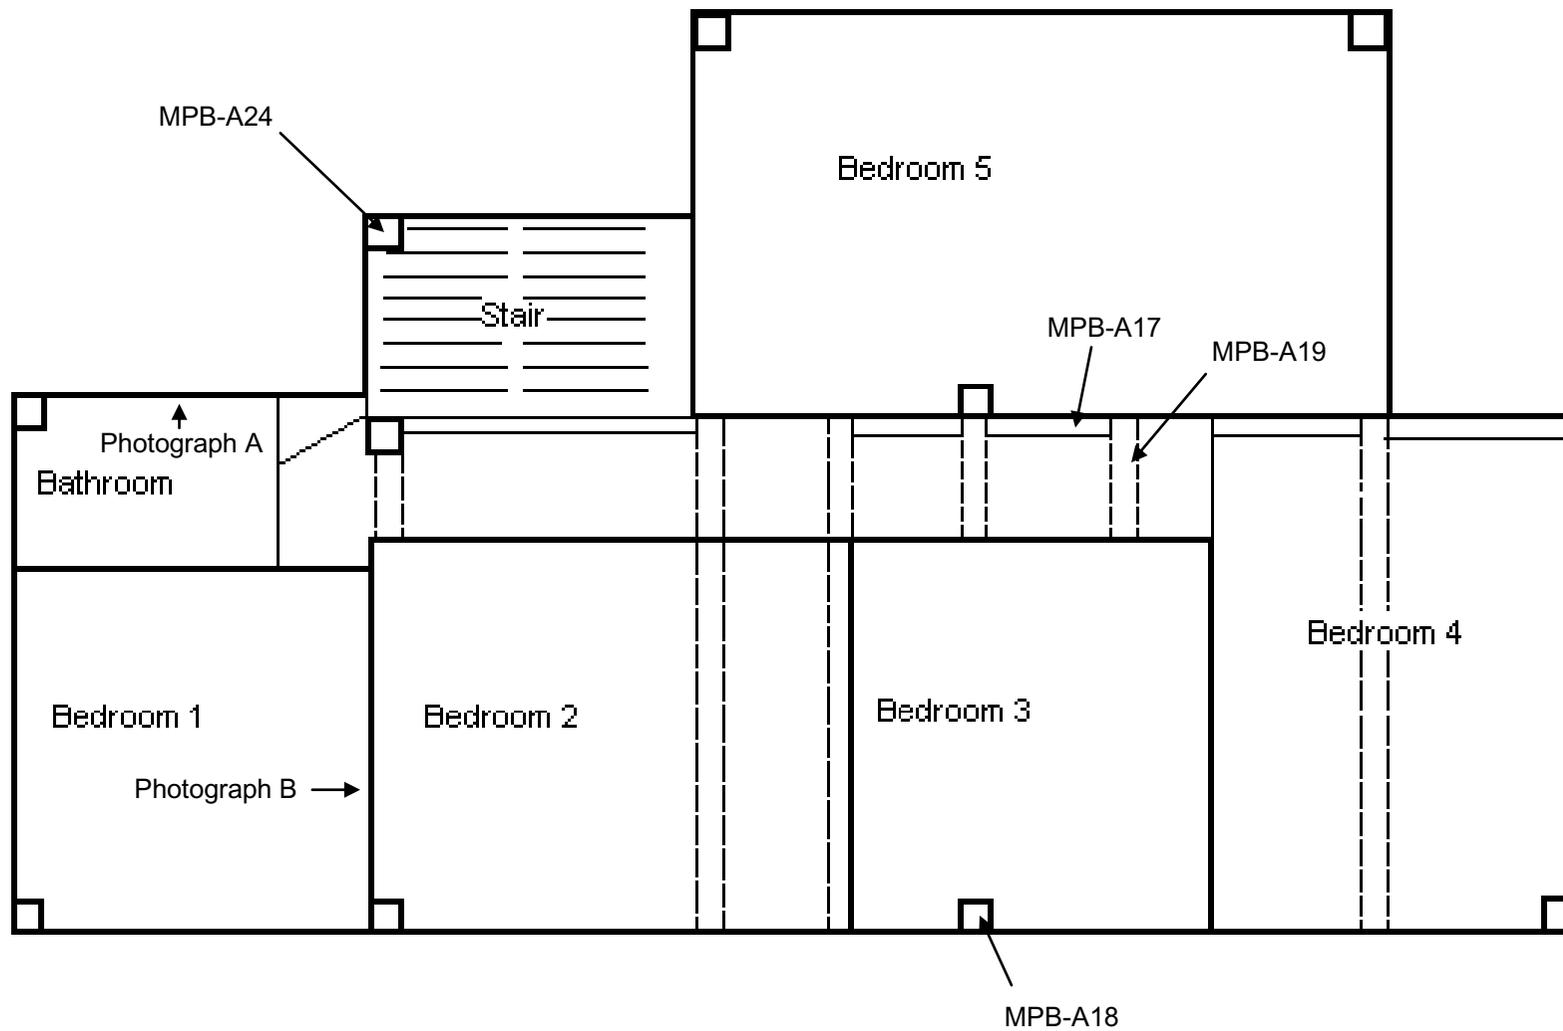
Schematic plan of the first floor, showing the location of samples MPB-A17-19 and MPB-A24
